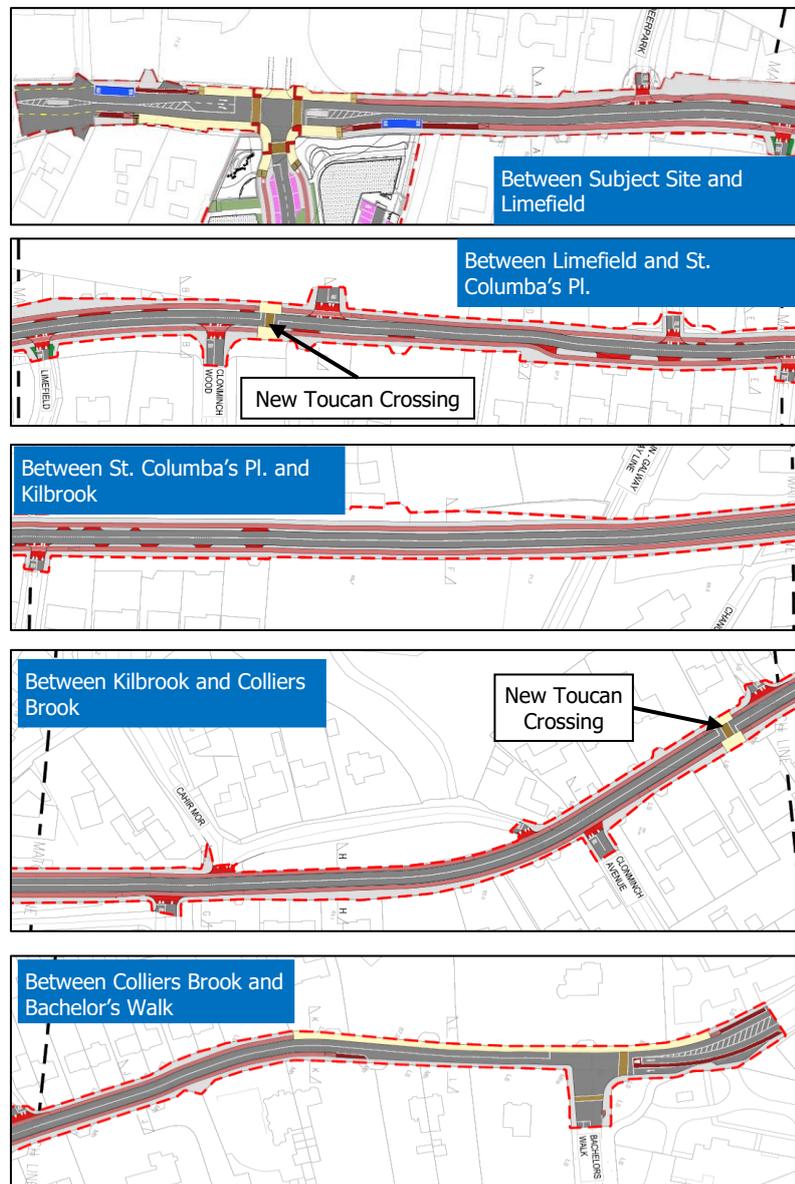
Proposed Clonminch Road Cycle Scheme
